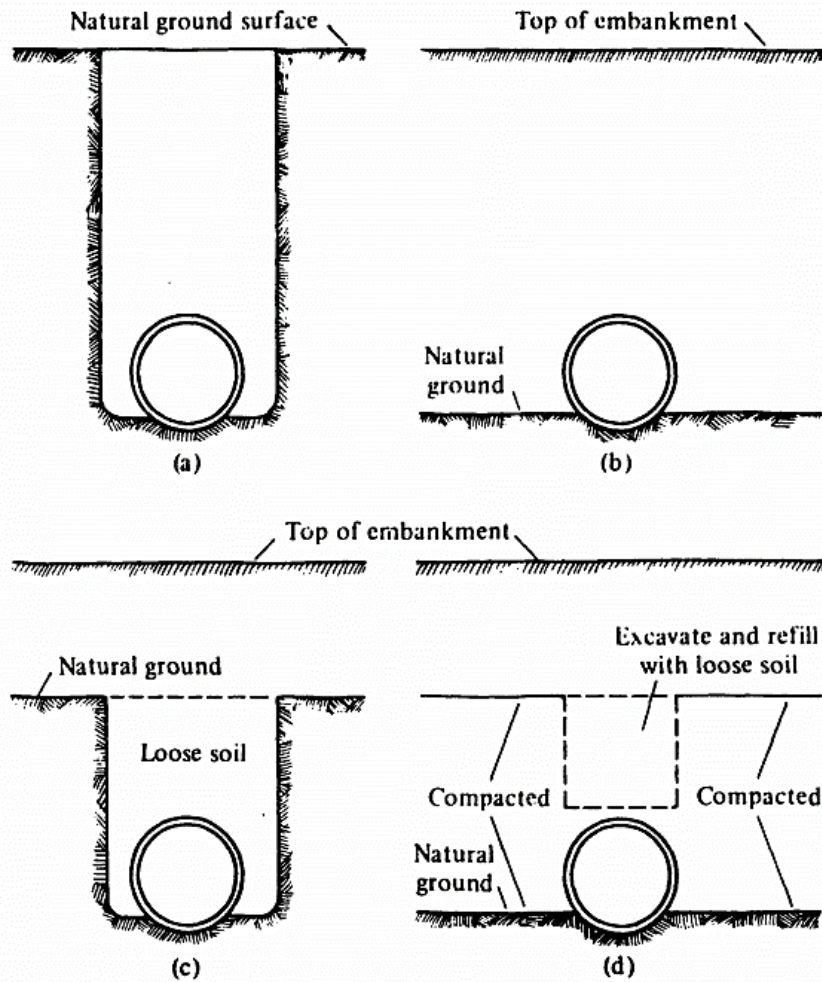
Various Classes of Conduit Installations: (a) Ditch Conduit, (b) Positive Projecting Conduit, (c) Negative Projective Conduit, and (d) Imperfect Ditch Conduit (Spangler & Handy, 1973)
